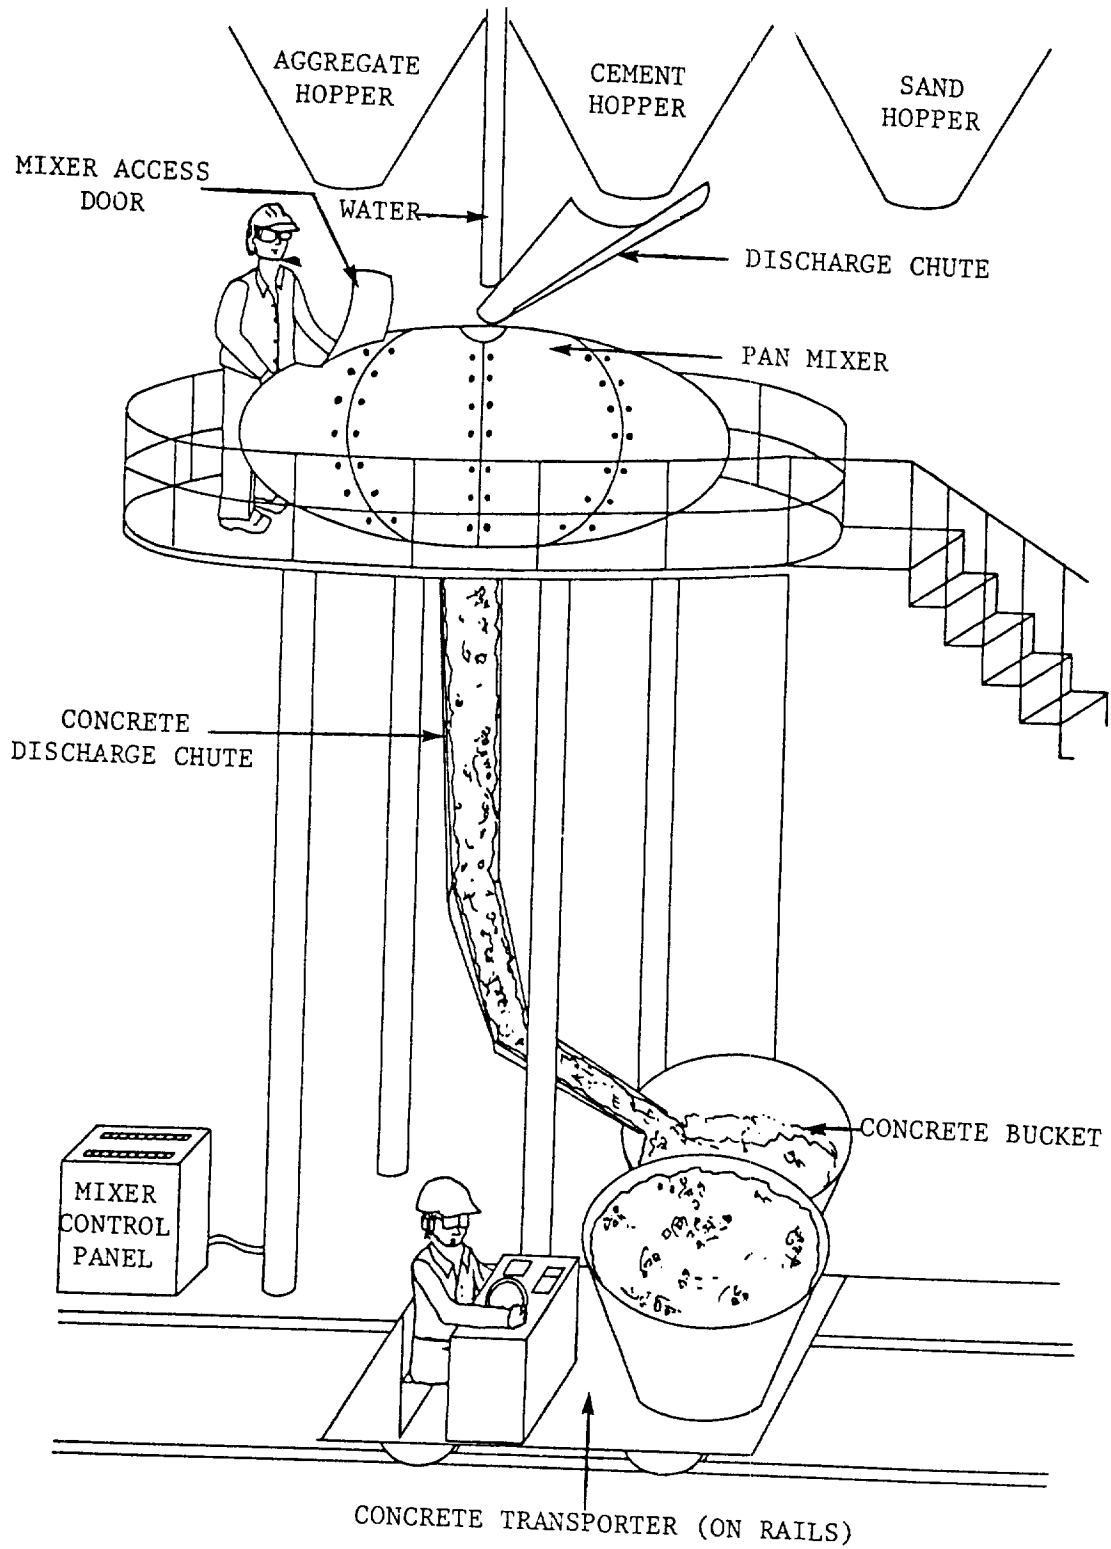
CONCRETE BATCHING, MIXING, DISCHARGE, AND TRANSPORT SYSTEM
